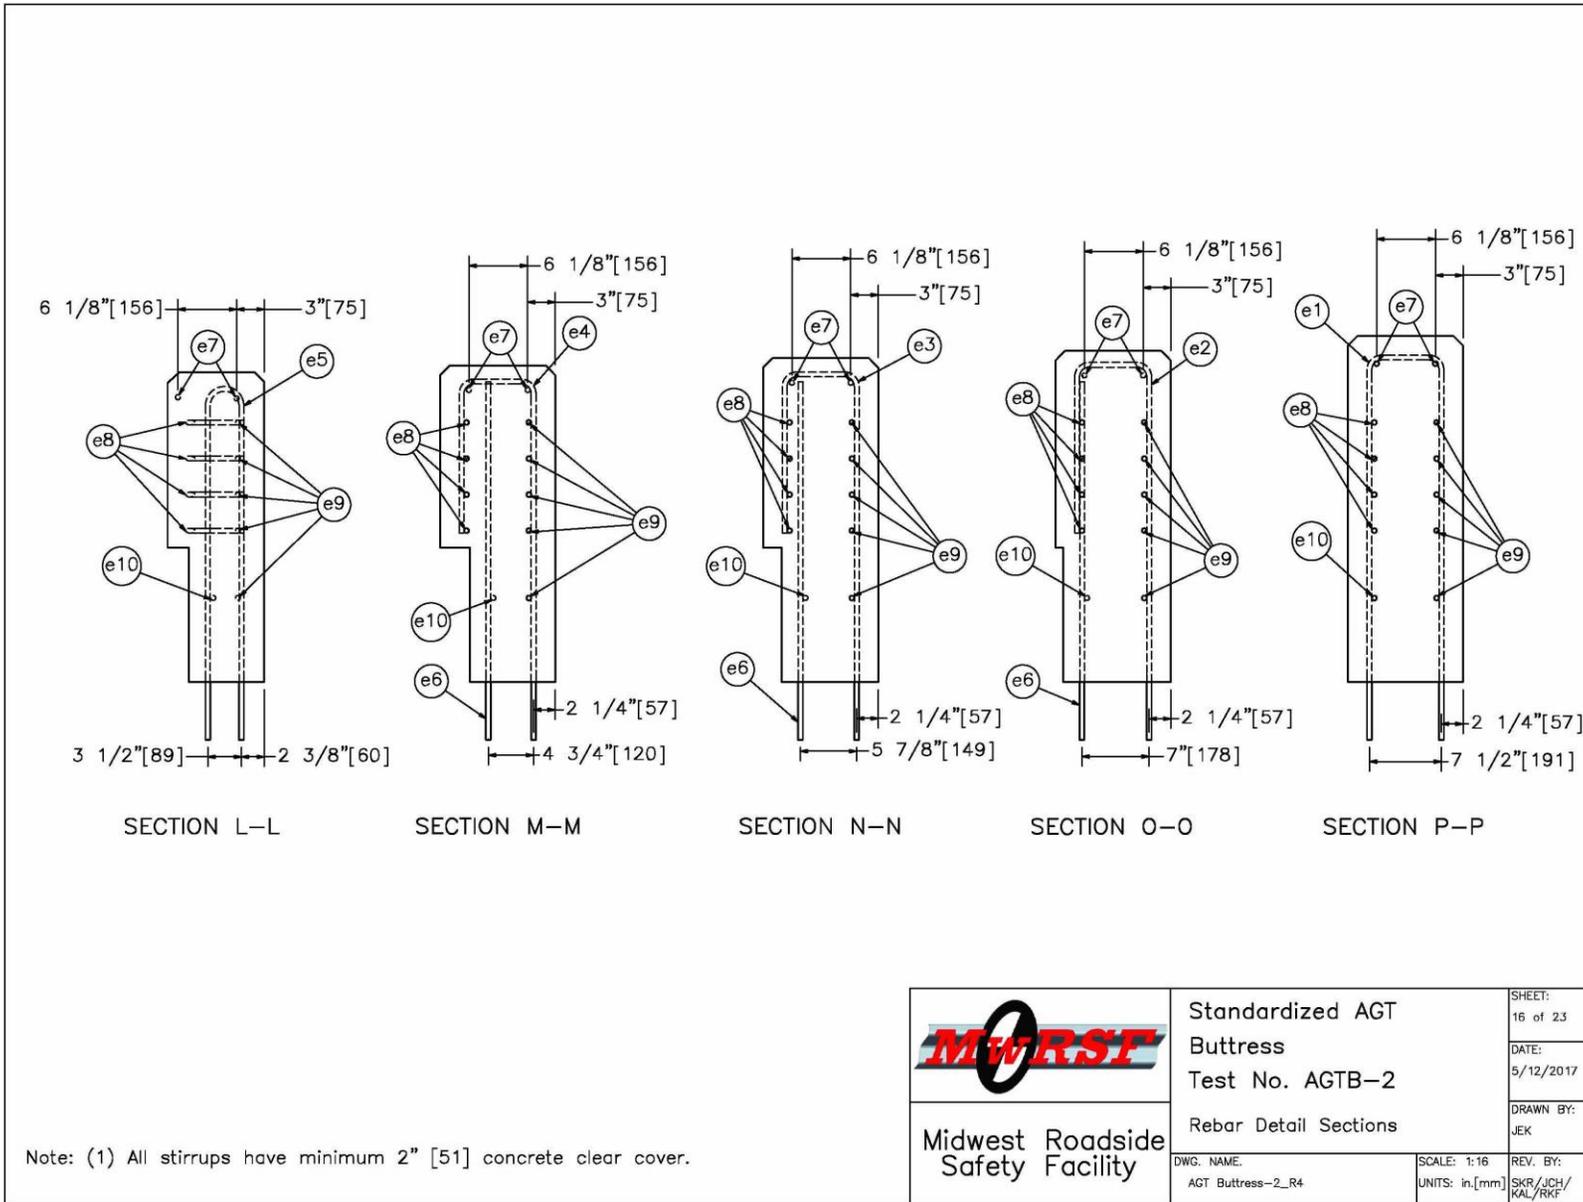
Rebar Detail Sections, Test No. AGTB-2
